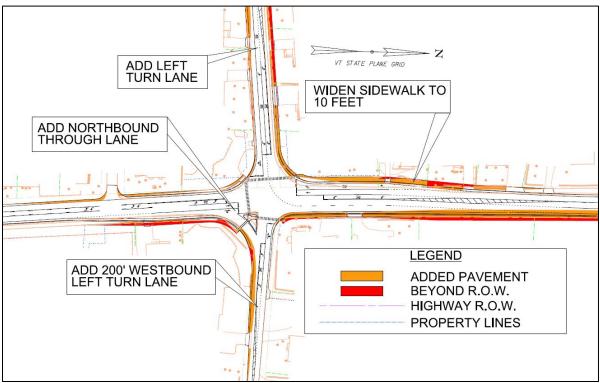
Proposed VT 2A/Industrial Avenue/Mountain View Road Intersection Plan
